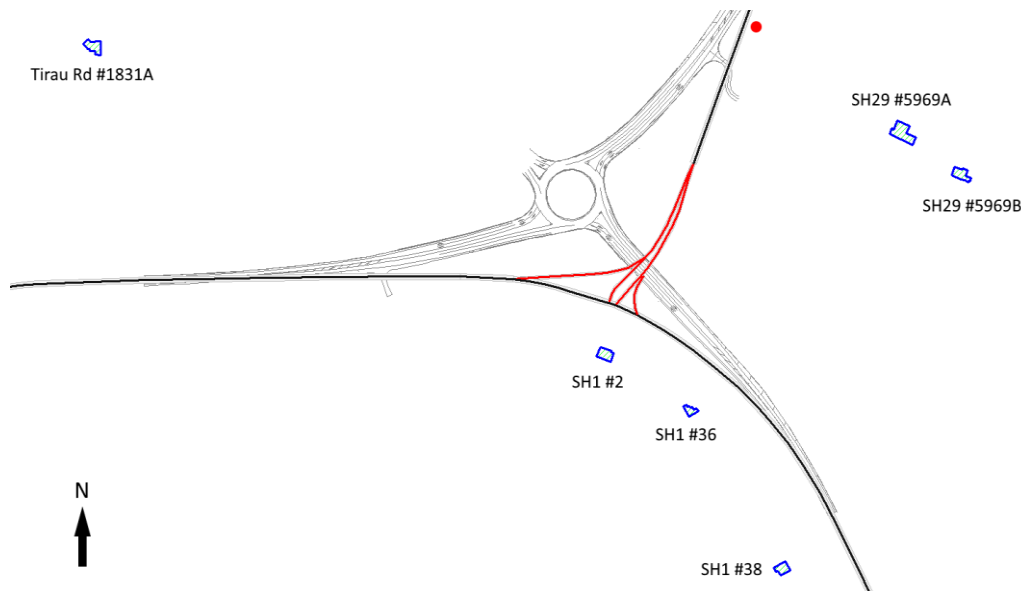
Project layout, showing existing roads (bold black and red lines), the proposed roundabout layout (grey), PPFs (blue), and the closest power pylon (red dot)
